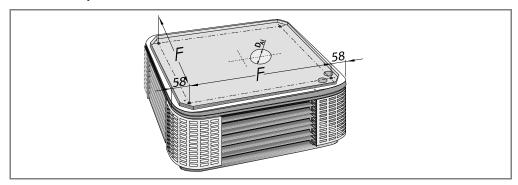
Drilling dimensions for ceiling-mounted Multi Flair unit heaters
